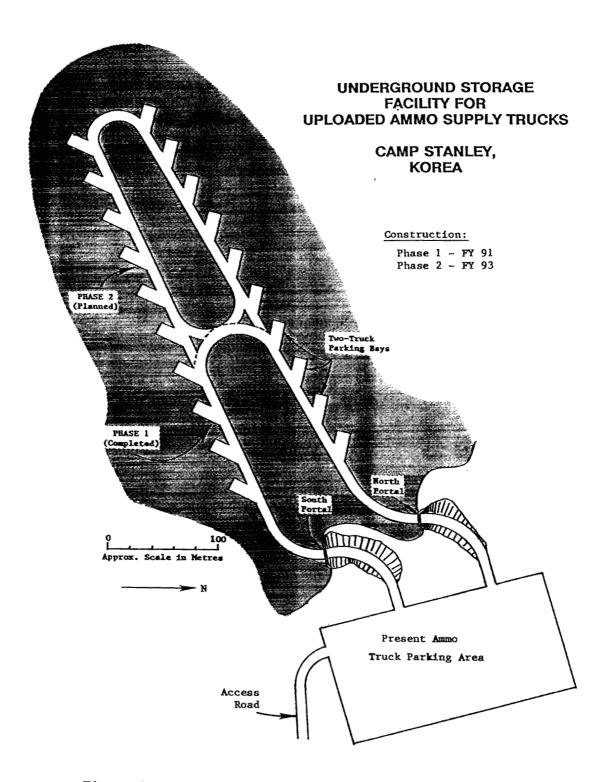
Layout (plan view) for Camp Stanley Underground Ammunition Storage Facility
